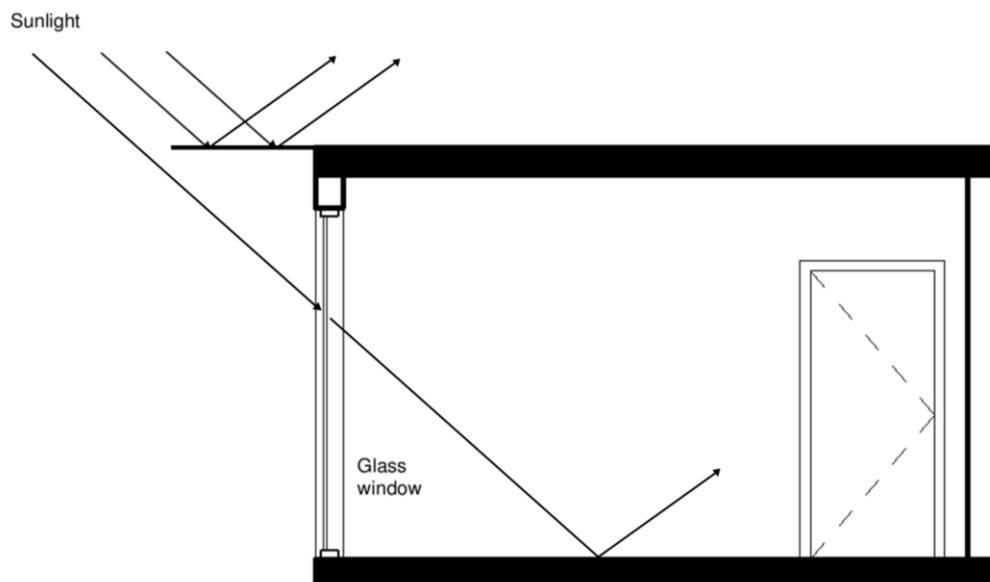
Overhang Shading Effect on Building Daylight (Author, 2021)
